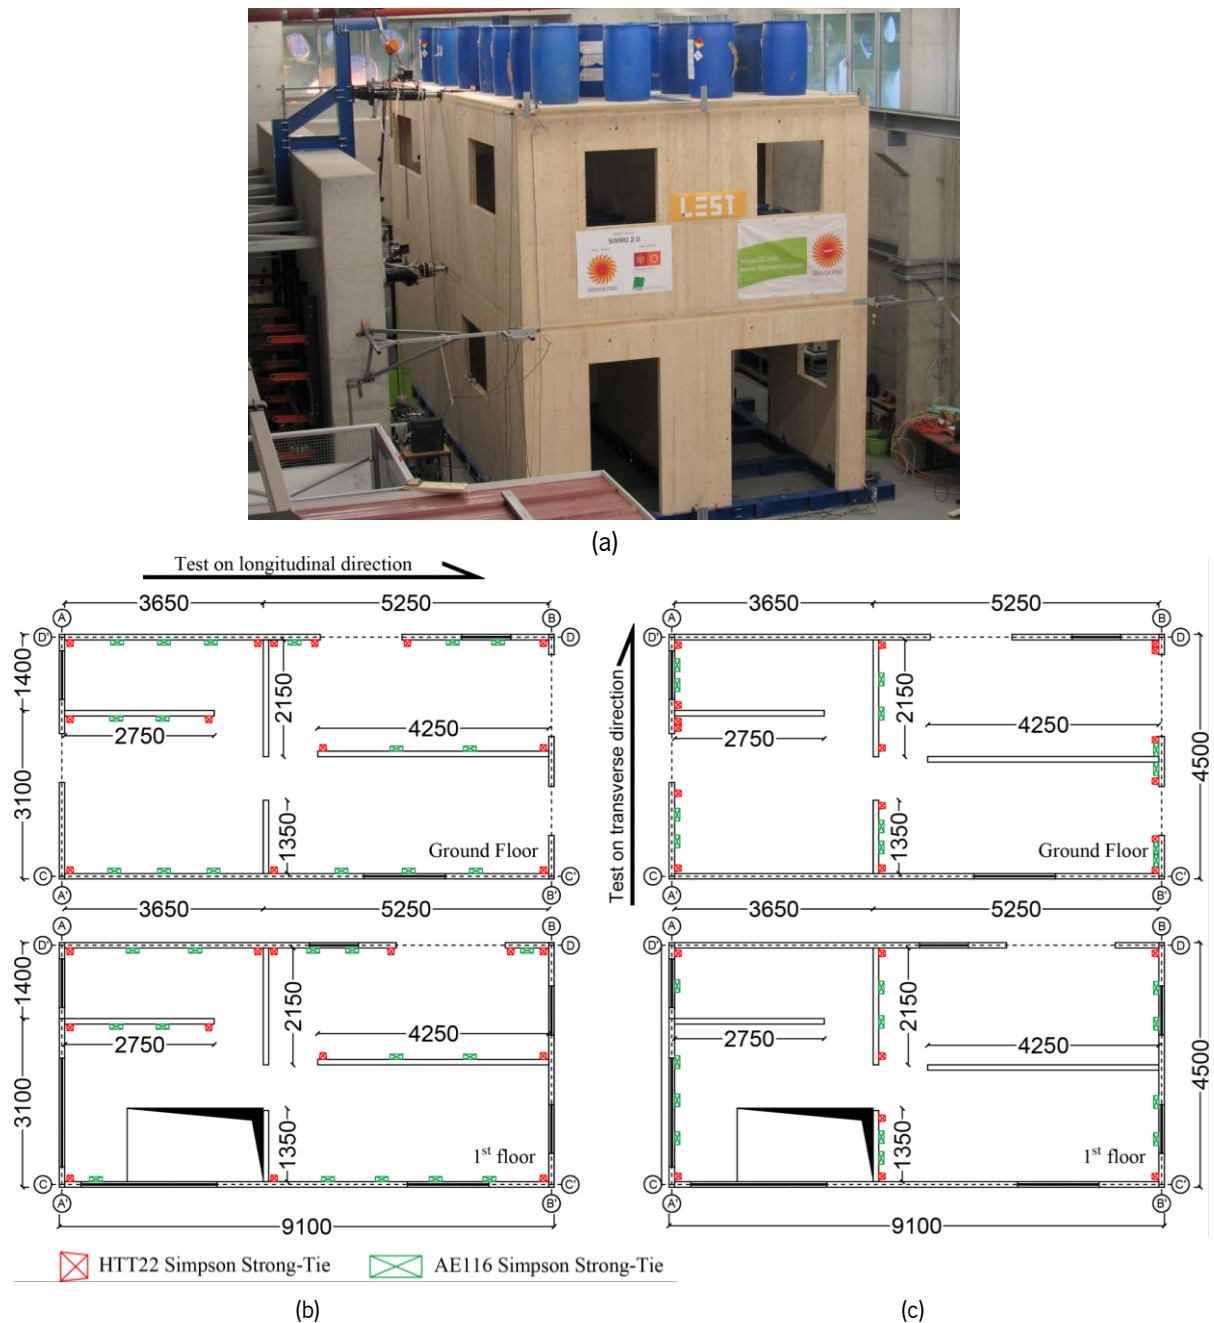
Panoramic image (a) and building plans, with the location of main connectors in the tests under longitudinal (a) and transversal (b) direction. (dimensions in mm).
